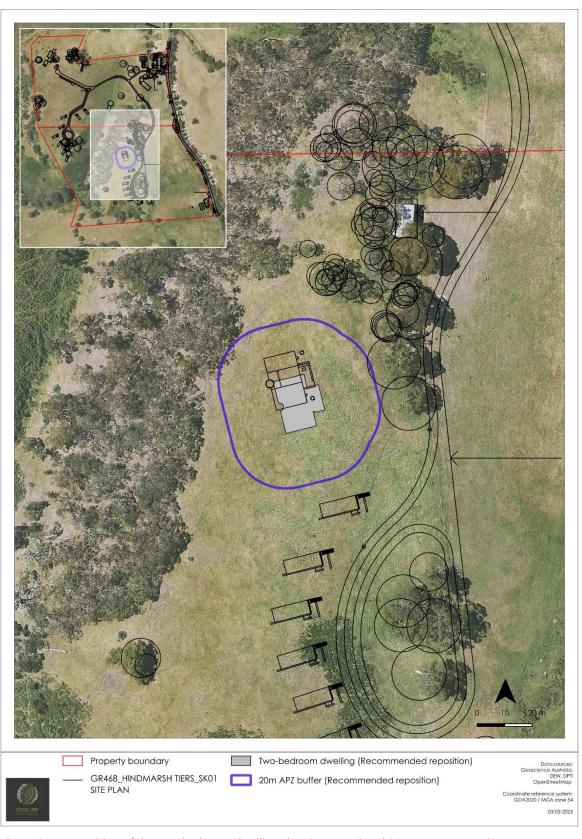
New position of the two-bedroom dwelling showing associated 20 m Asset Protection Zone
